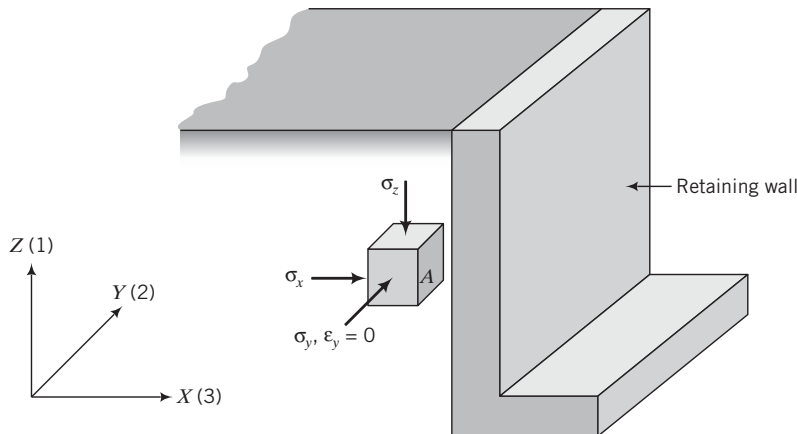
Plane strain condition in a soil element behind a retaining wall.
